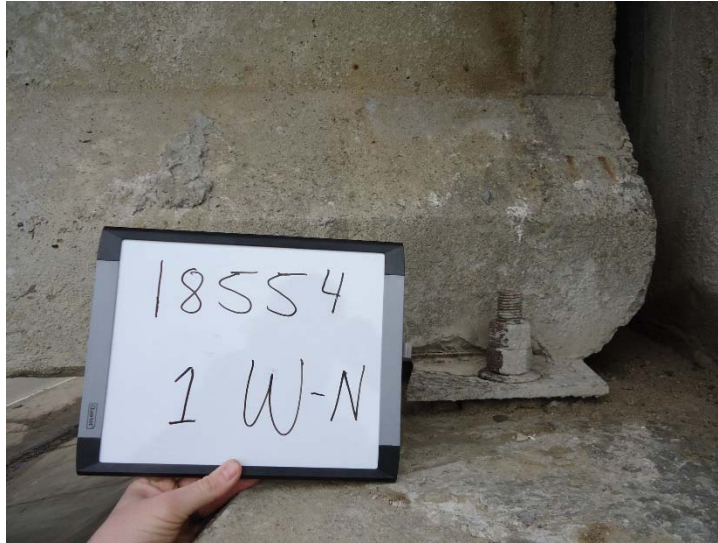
Bridge #18554, photo taken from northern side of the northernmost, west exterior girder
